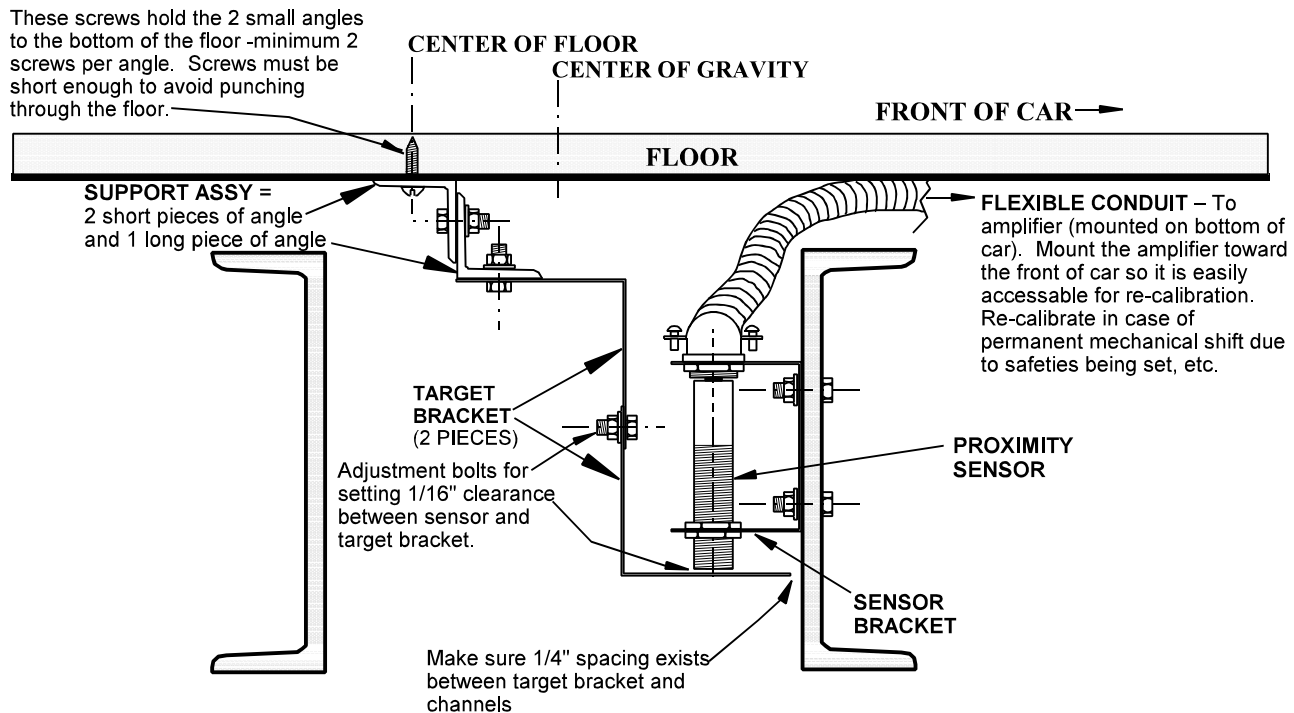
Target Bracket and Sensor mounted on Support Assembly and Car frame
